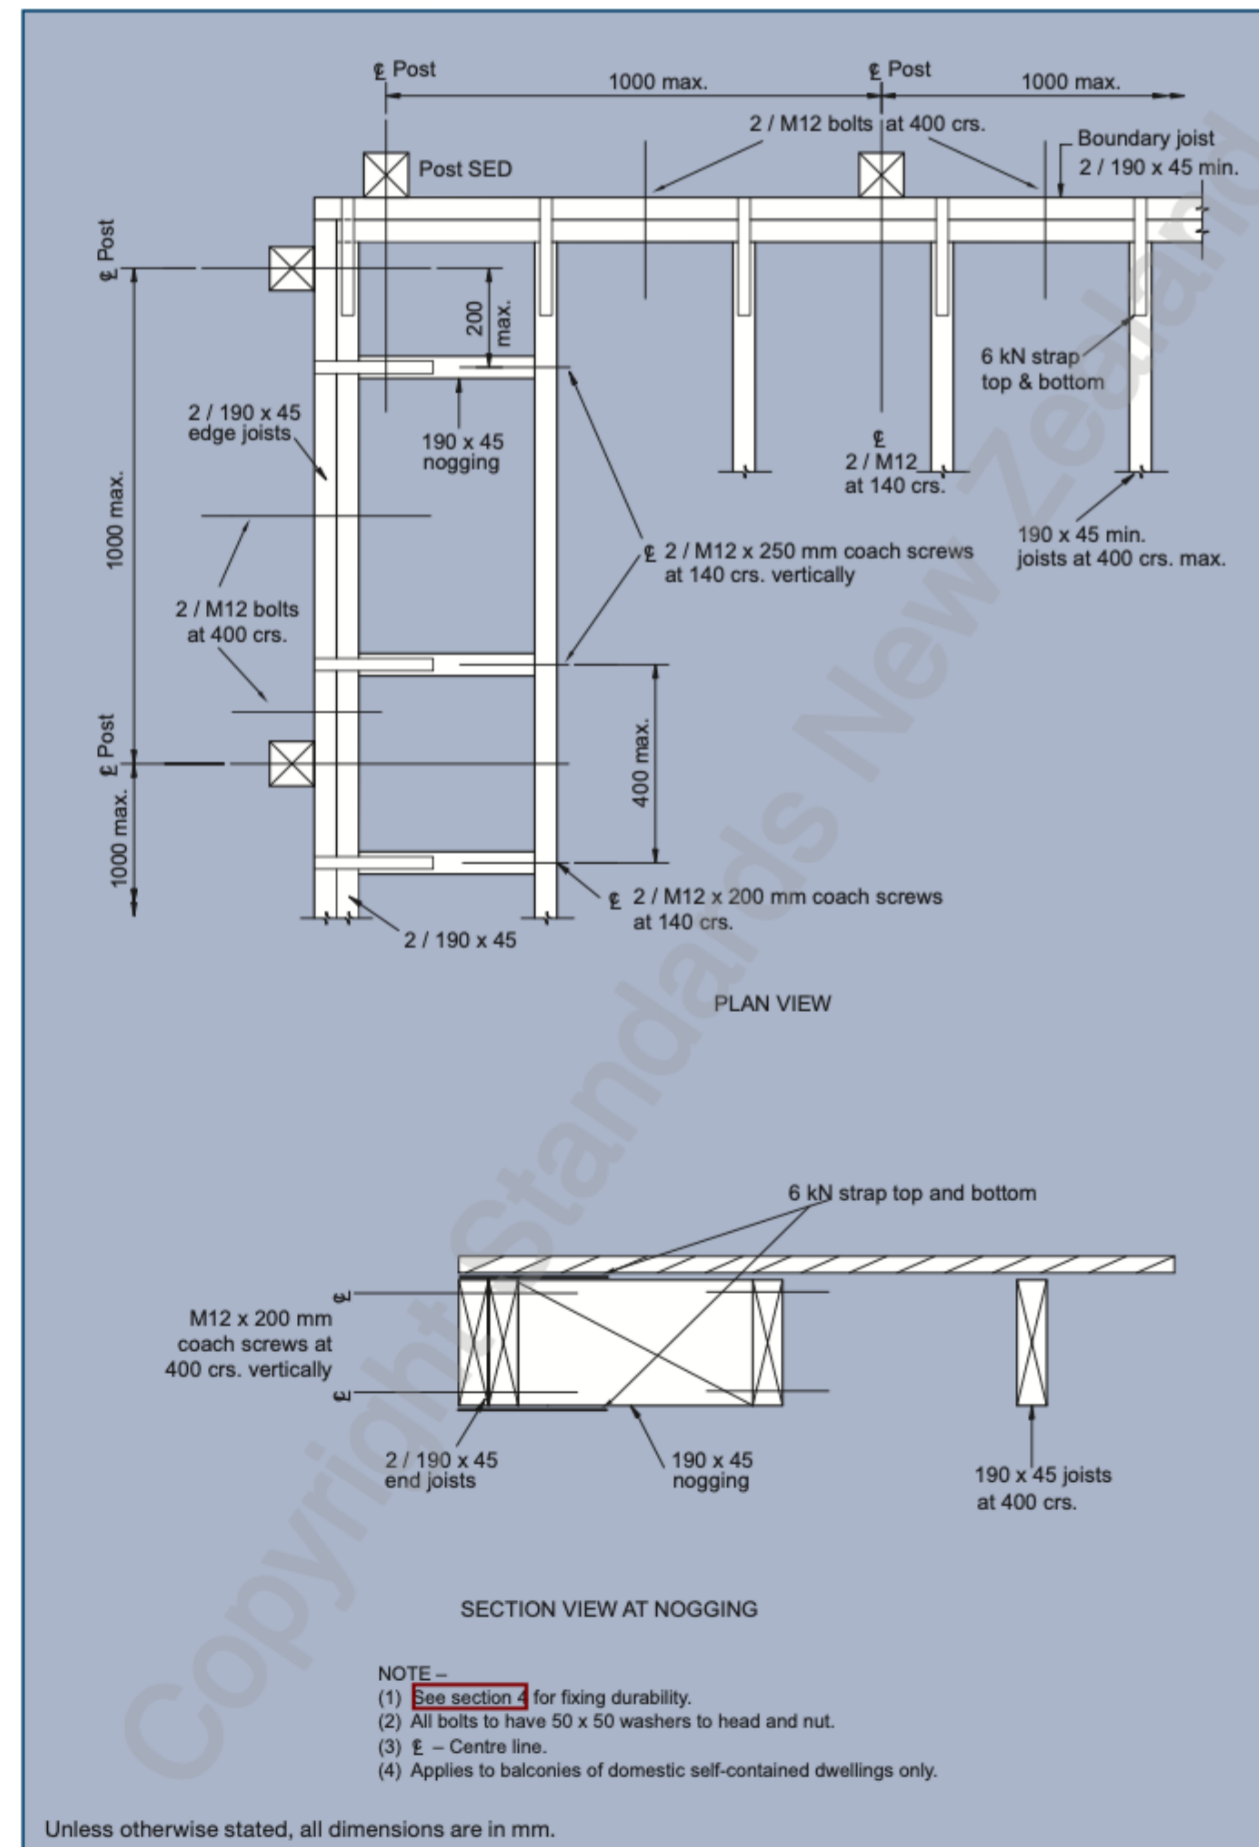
(c) – Face-fixed post support detail for cantilever balustrade (see 7.4.1.3)
